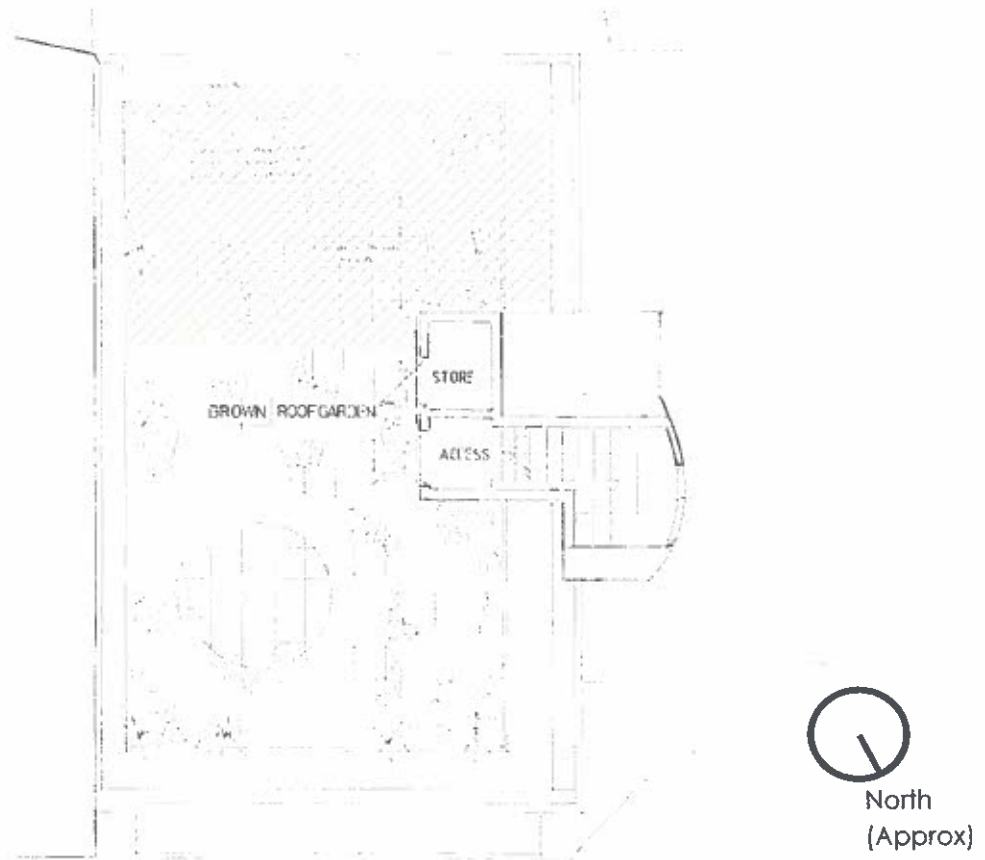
Proposed Roof Plan (© Alec Alexandrou)
